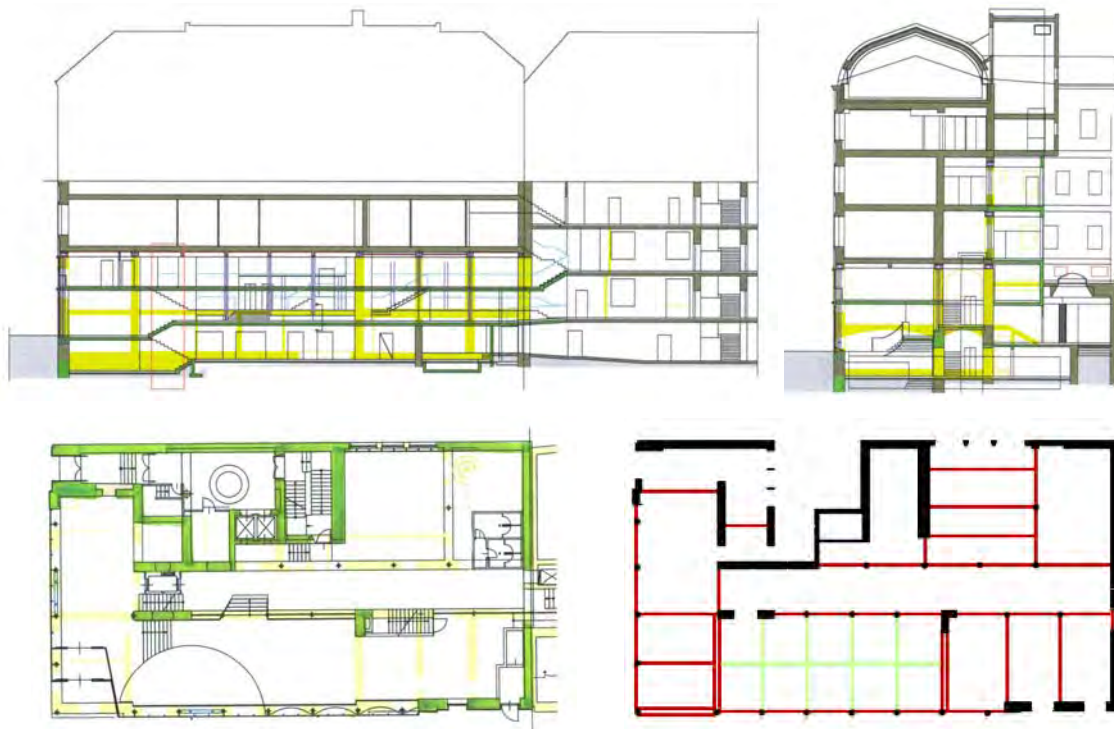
Overview of the refurbishment – replacement of brick walls by a column and beam grid
